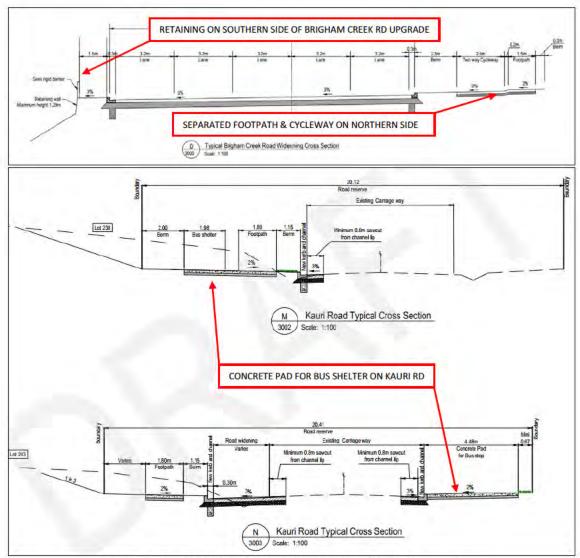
Upgraded Brigham Creek Road and Kauri Road Typical Cross-sections
